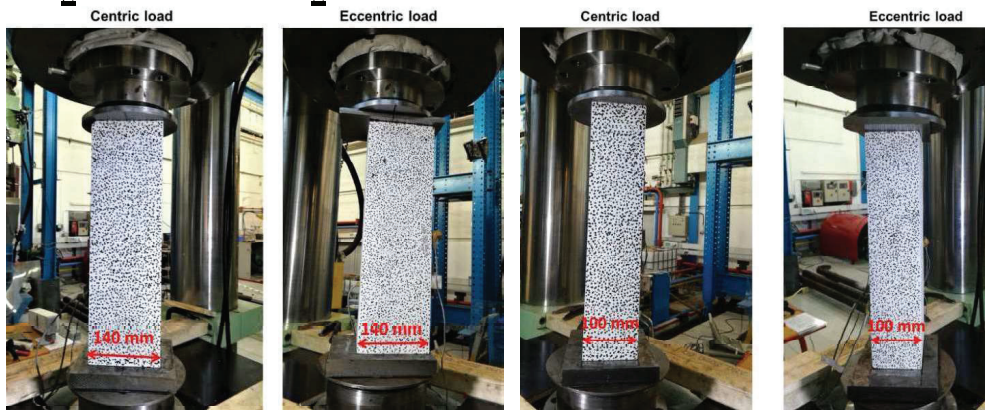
Prism in the 1000 kN testing machine. Wide side-140mm (left) and short side-100 mm (right).
